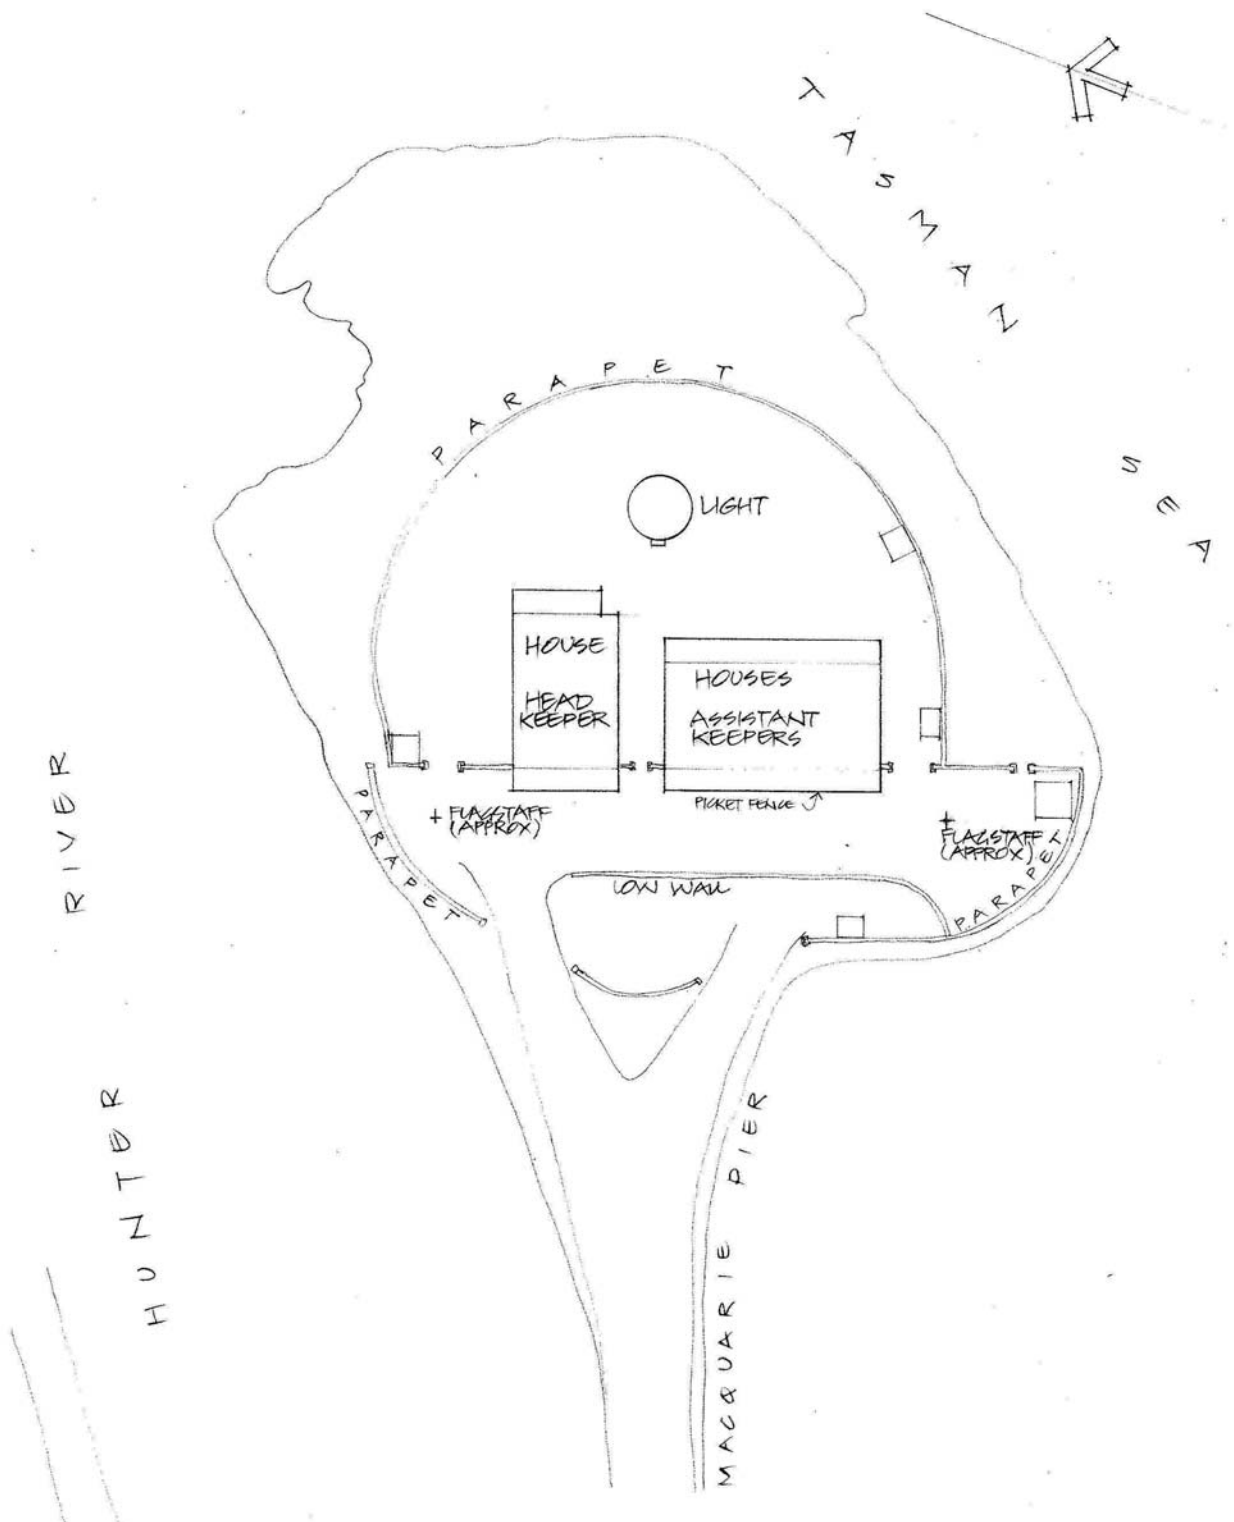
Nobby's Light and Signal Station, original layout. Based on Plan B32, Suters Architects, Nobbys Head, Macquarie Pier, Southern Breakwater Conservation Management Plan – Revised, sourced to Newcastle Port Corporation files. Not to scale.
